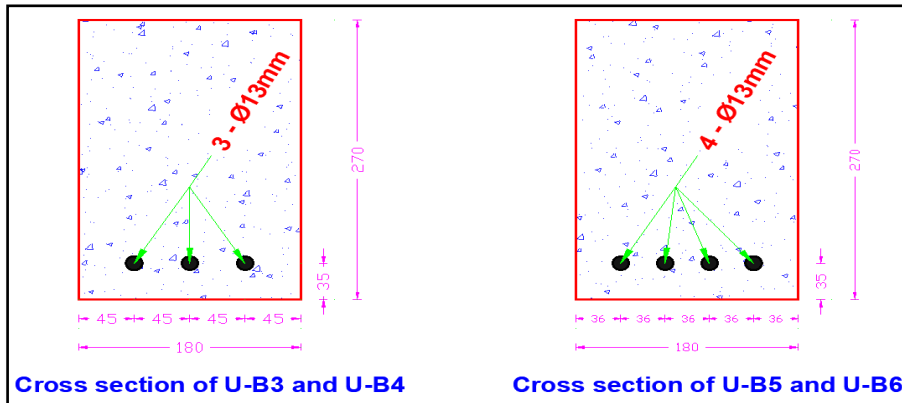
Cross-sectional dimensions and reinforcement details of the tested beams, mm
